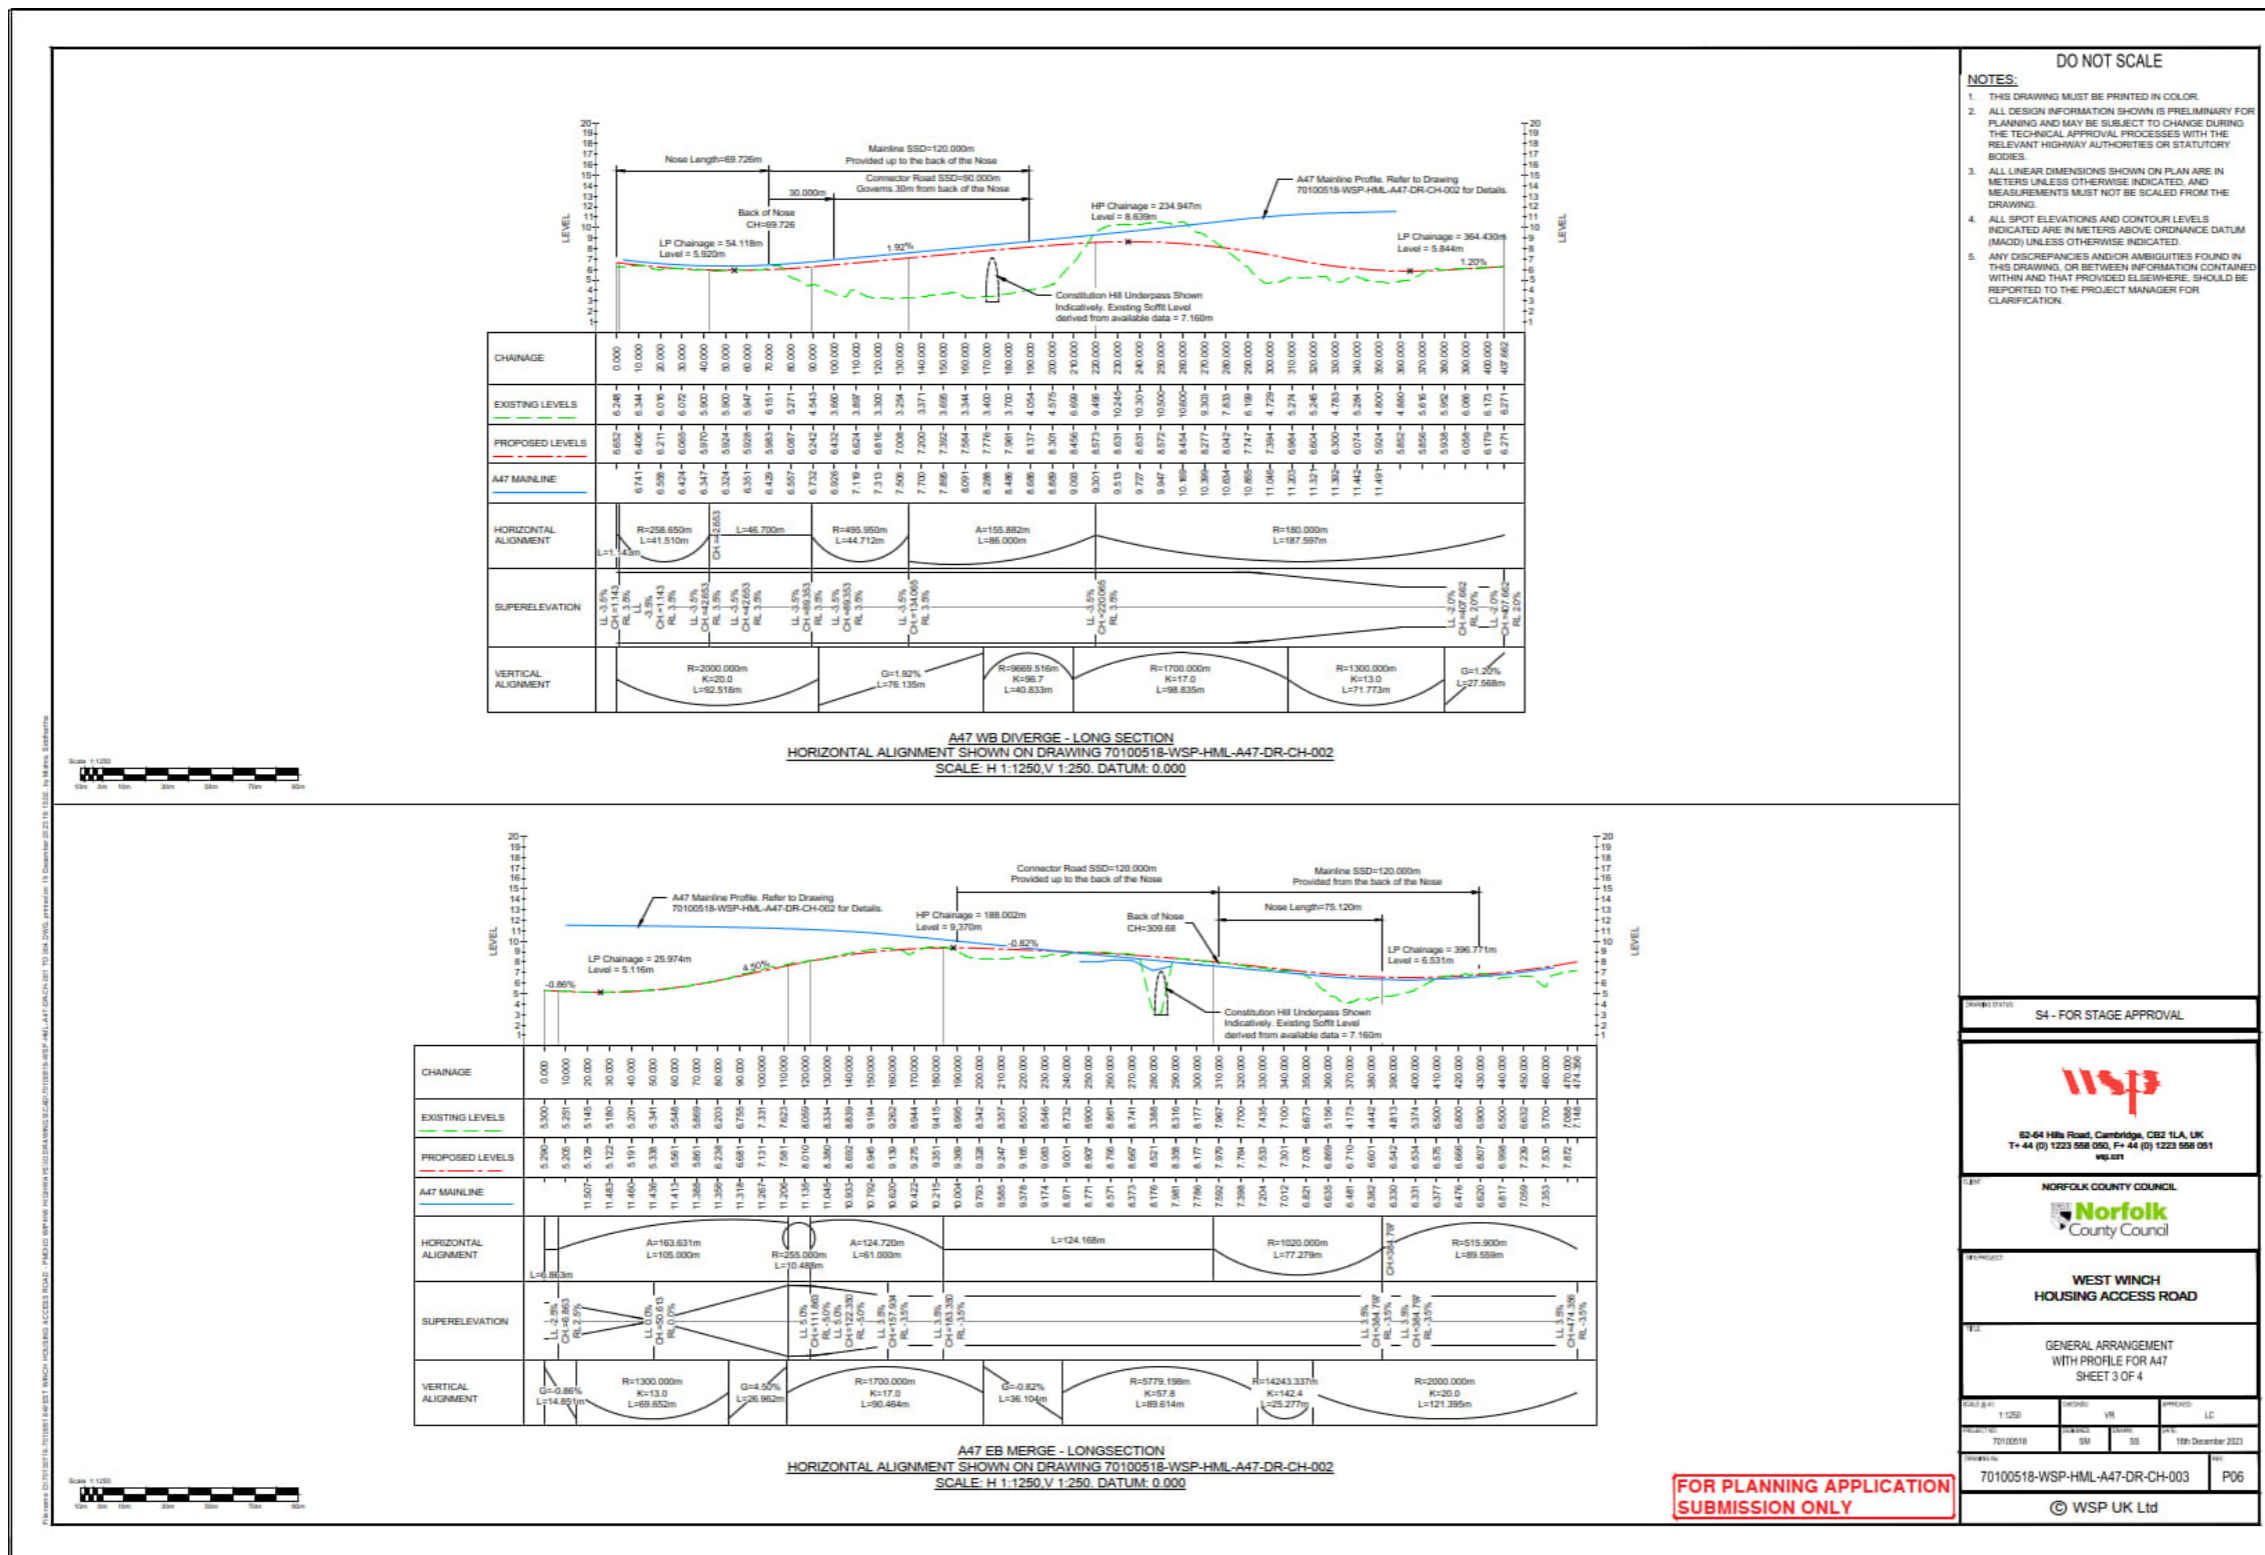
General Arrangement Plan and Profile for A47 (Sheet 3 of 4)
